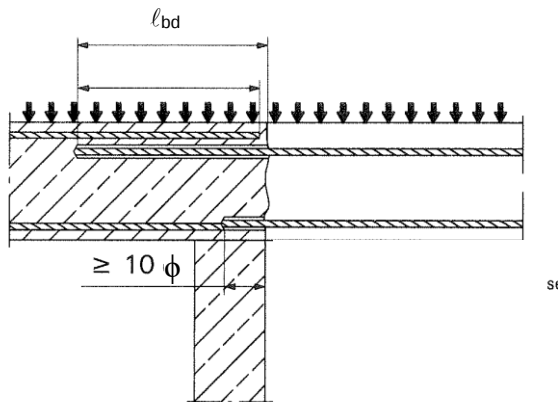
Overlapping joint at a foundation of a wall or column where the rebars are stressed in tension
